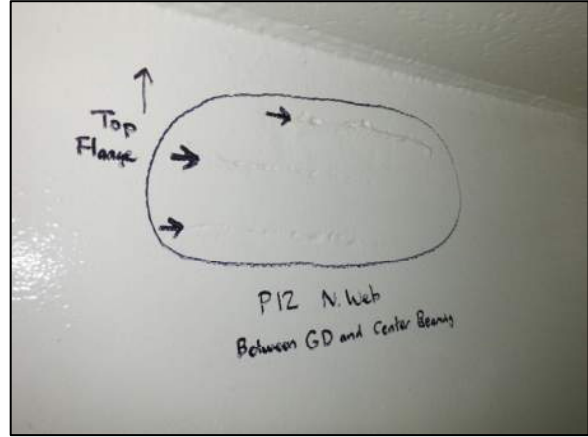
Three Gouges in North Web, Between Girder D and Center Bearing Diaphragm
